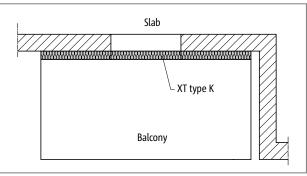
Schöck Isokorb® XT type K: Balcony with facade offset
